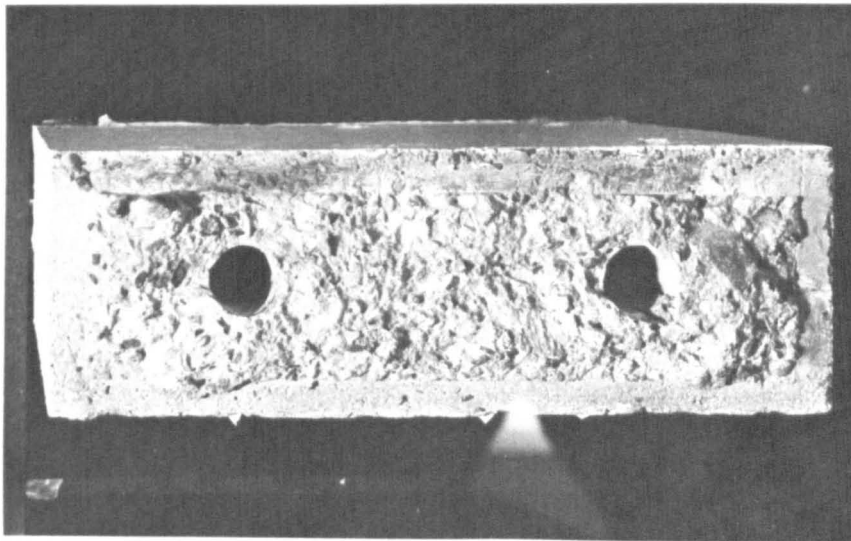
CRACK FACE OF SPECIMEN 2F(i).
